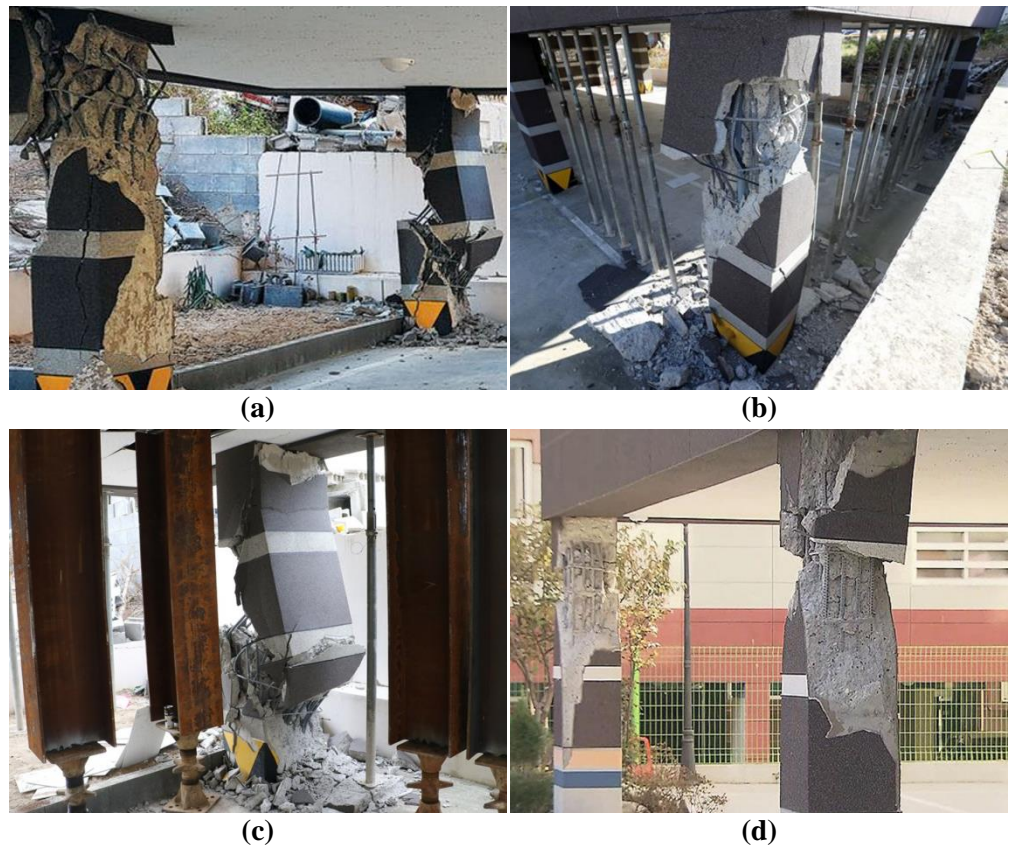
Damage of Piloti-type RC buildings. (a) Parking area; (b) opening space; (c) structural repairing; (d) school building.
